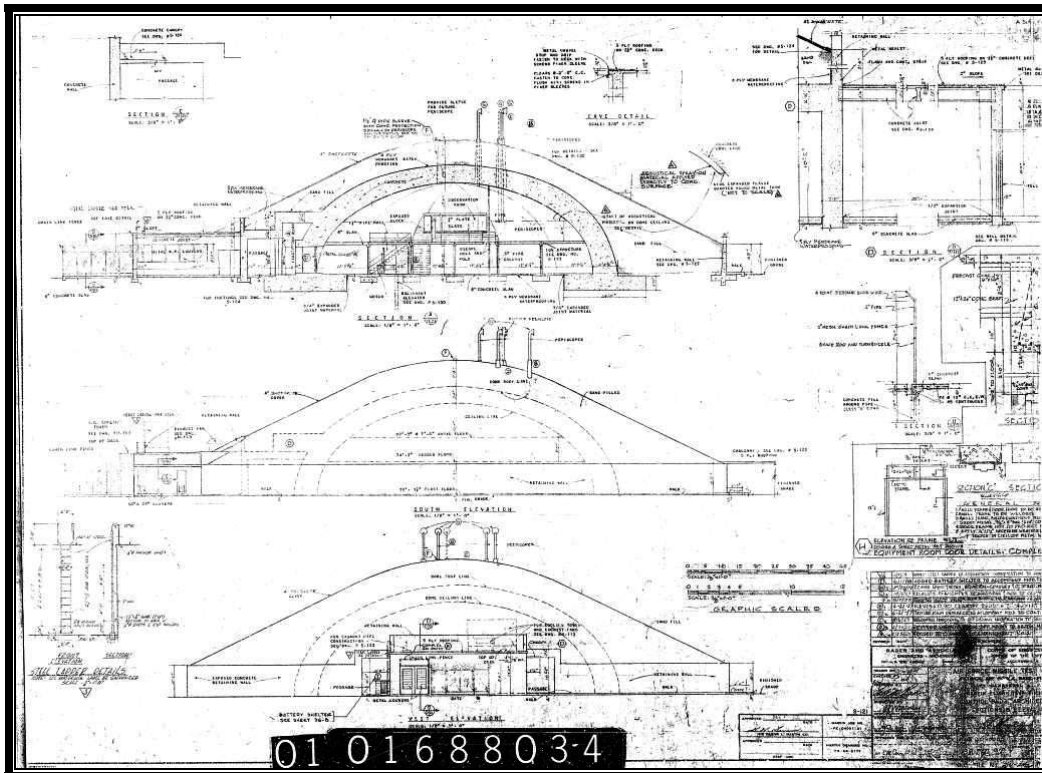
As-built drawing showing the blockhouse at LC-20 (Rader and Associates 1956).
